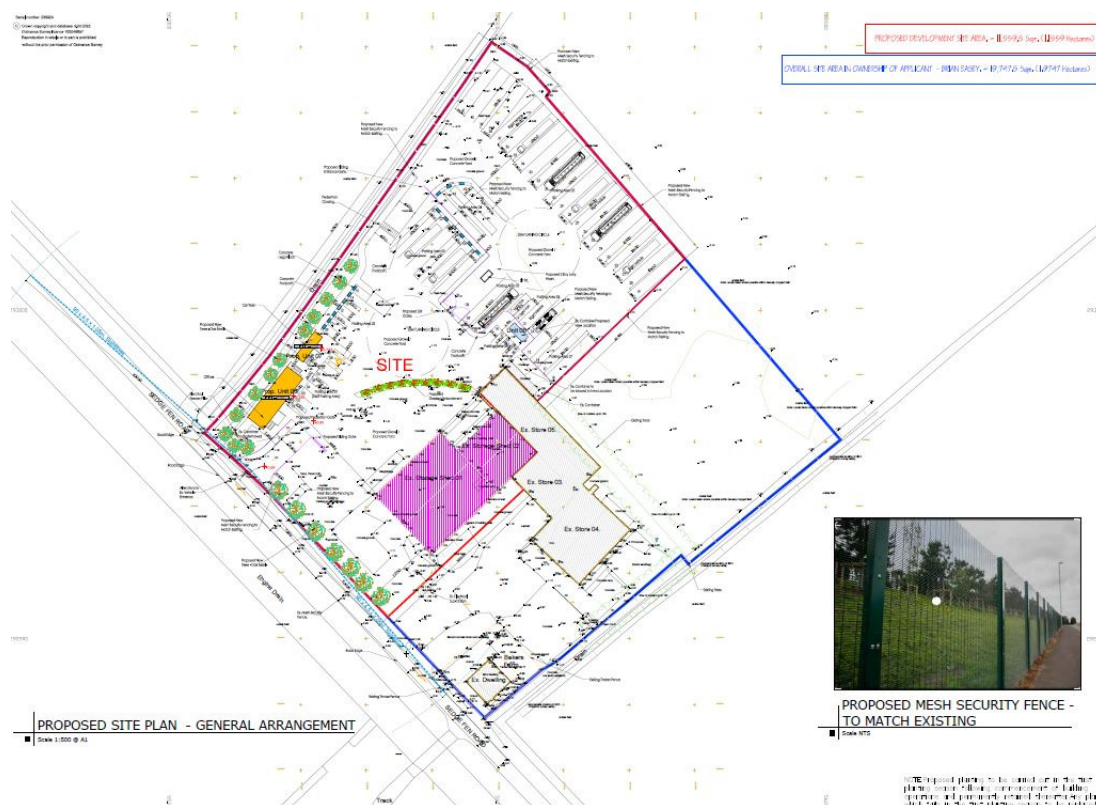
Proposed site layout - See drawing no. 2229-P-102 & 103-A for full details.
